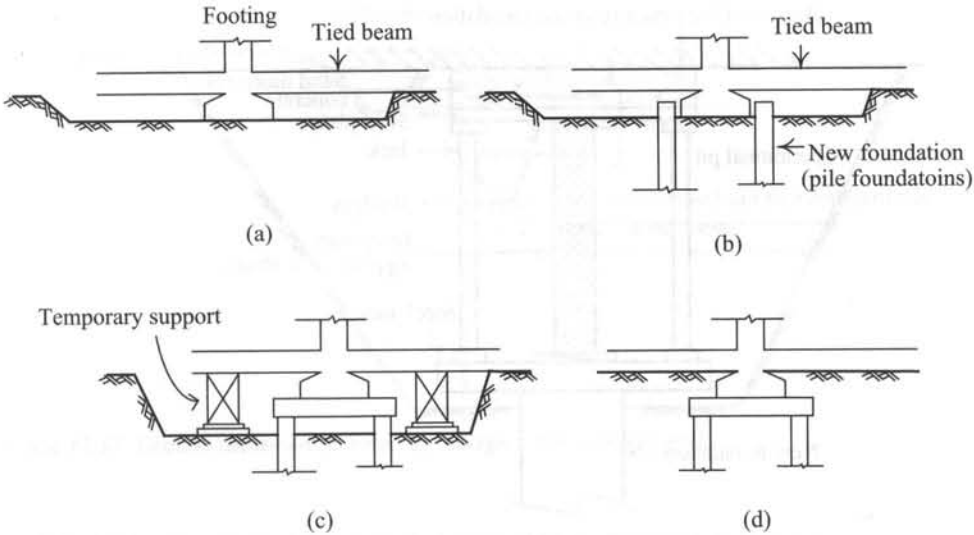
Underpinning an existing building by constructing new foundations: (a) excavation, (b) building new foundations, (c) installing bearing beams and temporary supports, and (d) load transferred to the new foundations and backfilling.
